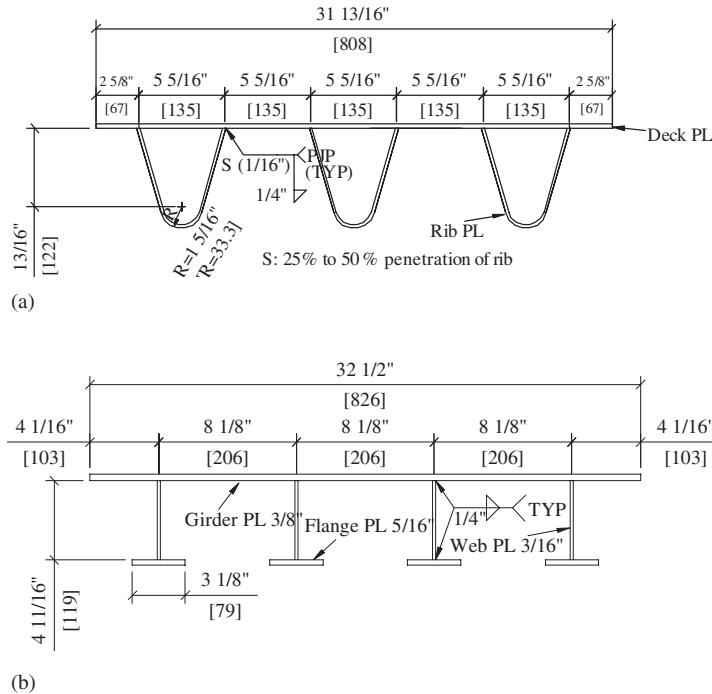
Cross-section of orthotropic bridge deck specimens: (a) specimen 1; and (b) specimen 2.
